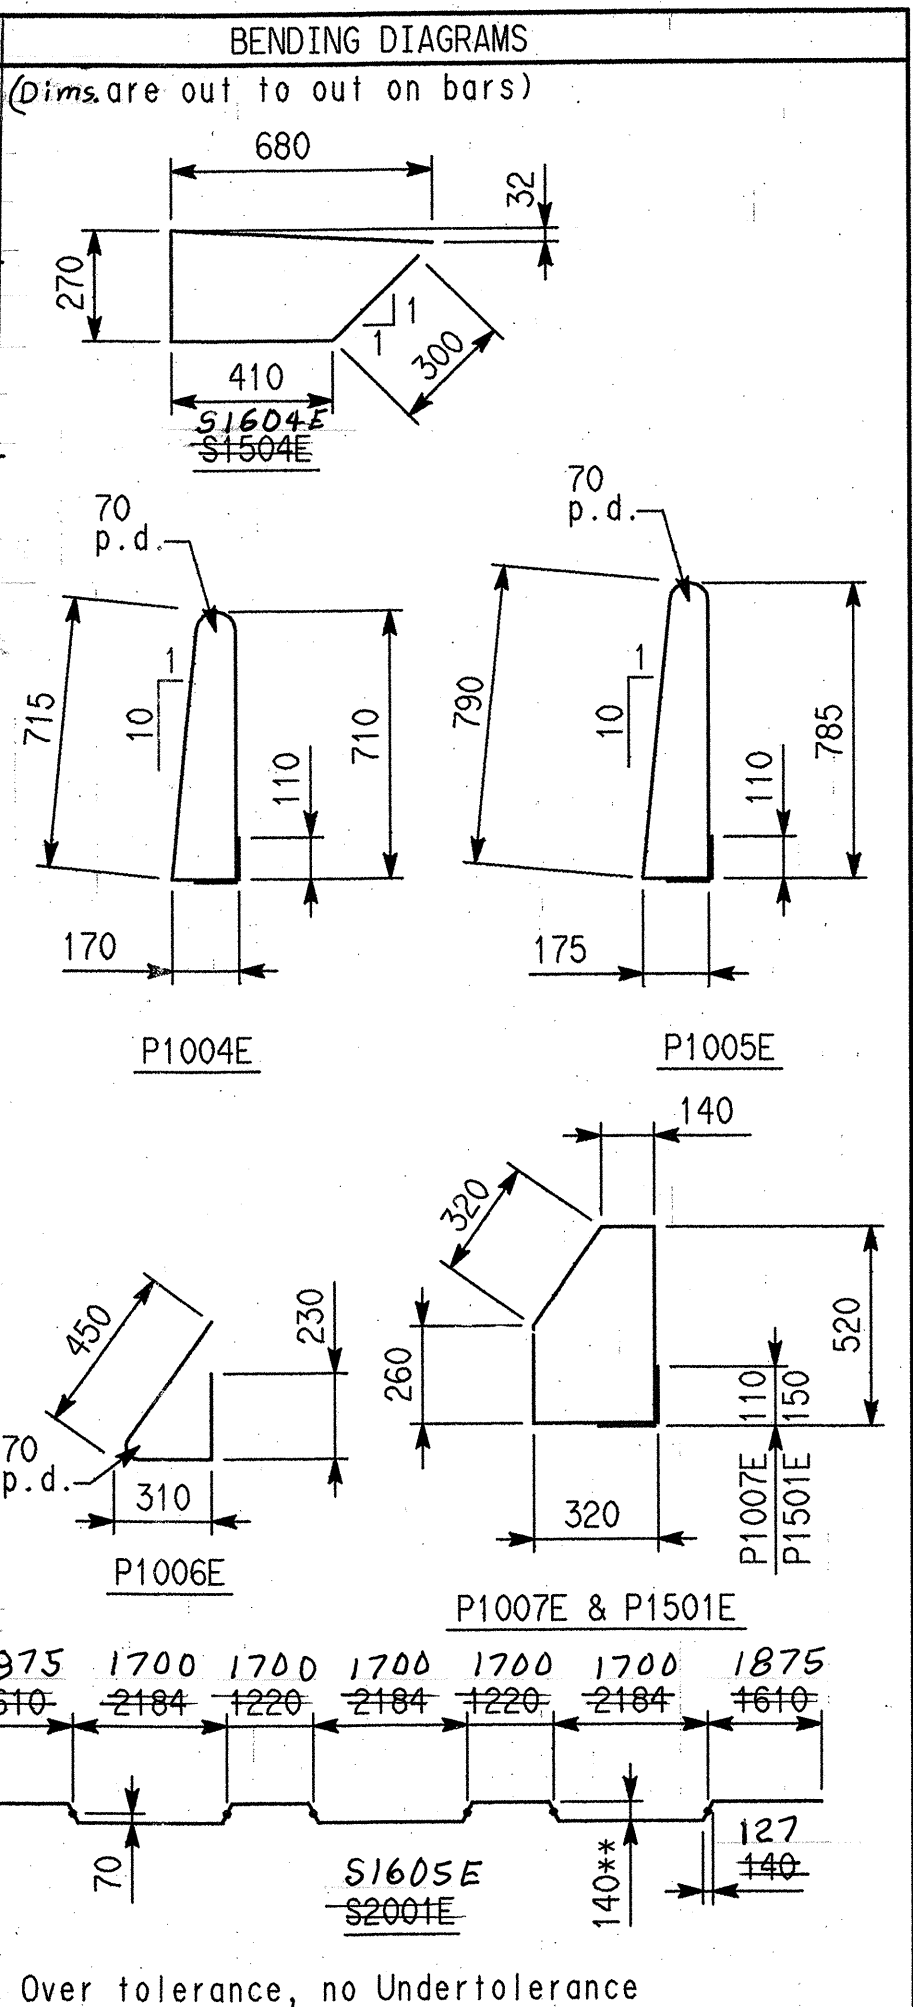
DETAILS OF OPTIONAL SLIPFORMING OF CONCRETE PARAPET RAIL (OPEN OR CLOSED)
